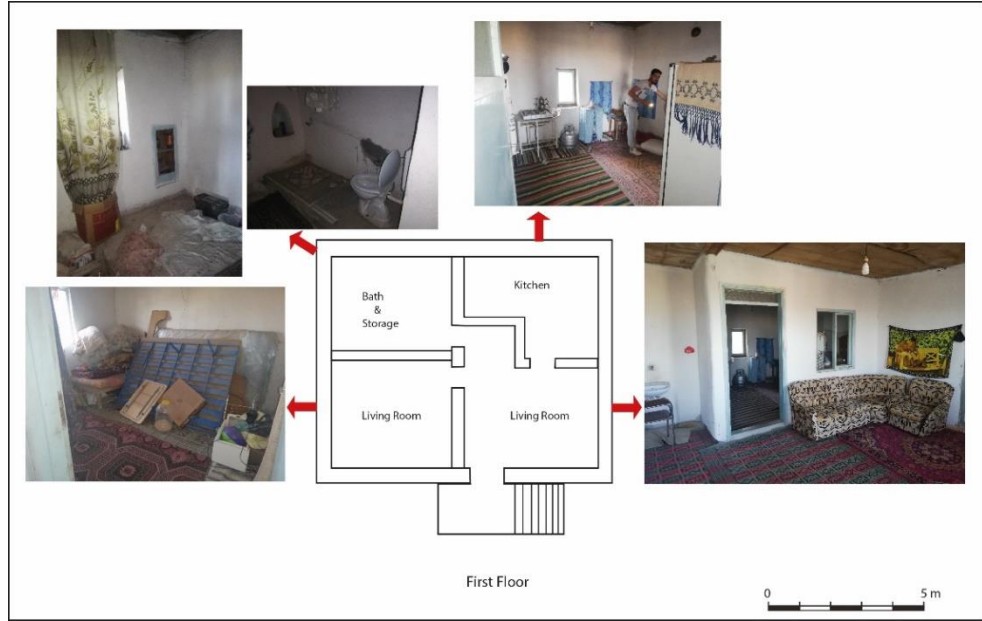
Mehmet Aydın's House First Floor (Photo and Illustrated by M. Çarkı)
